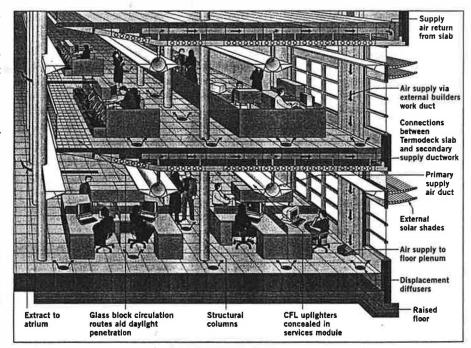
A floor zone in cross section detailing the services beam (just above head level) and the ductwork system that connects the Termodeck slabs to the underfloor displacement ventilation.
